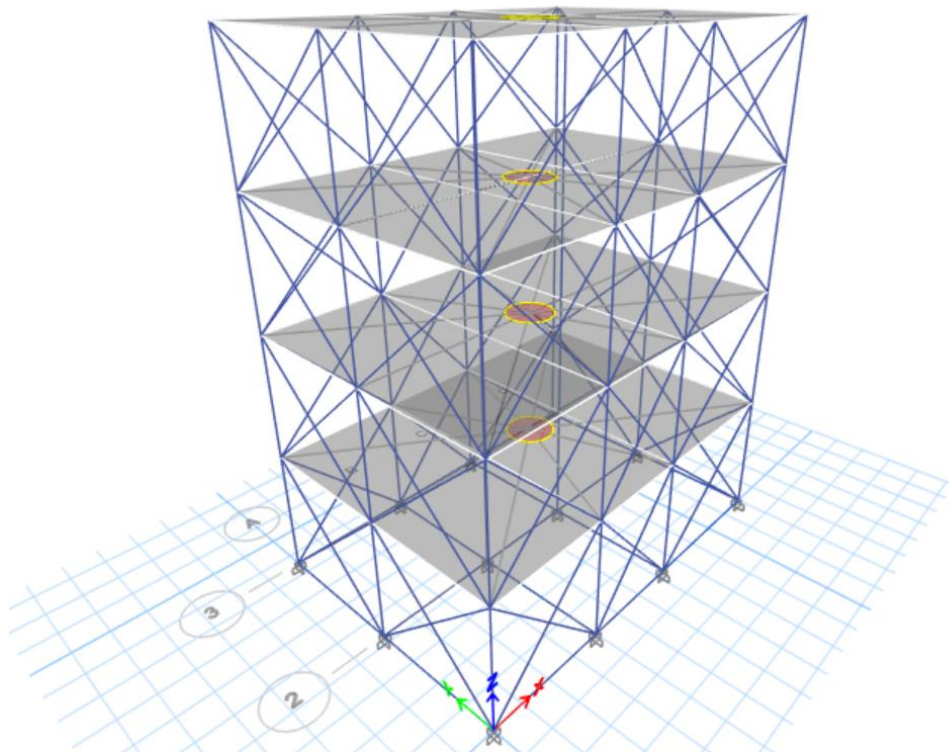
3D view of CMS with wall modeled as a cross diagonal strut
